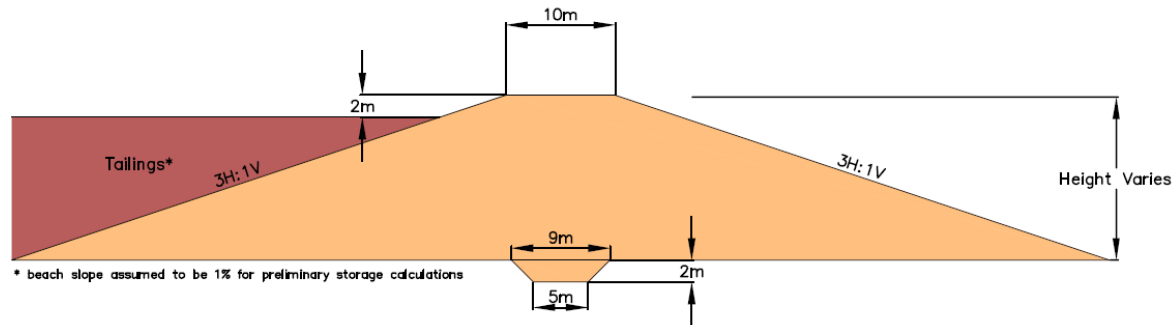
Embankment Cross Section Assumed for Siting Study
